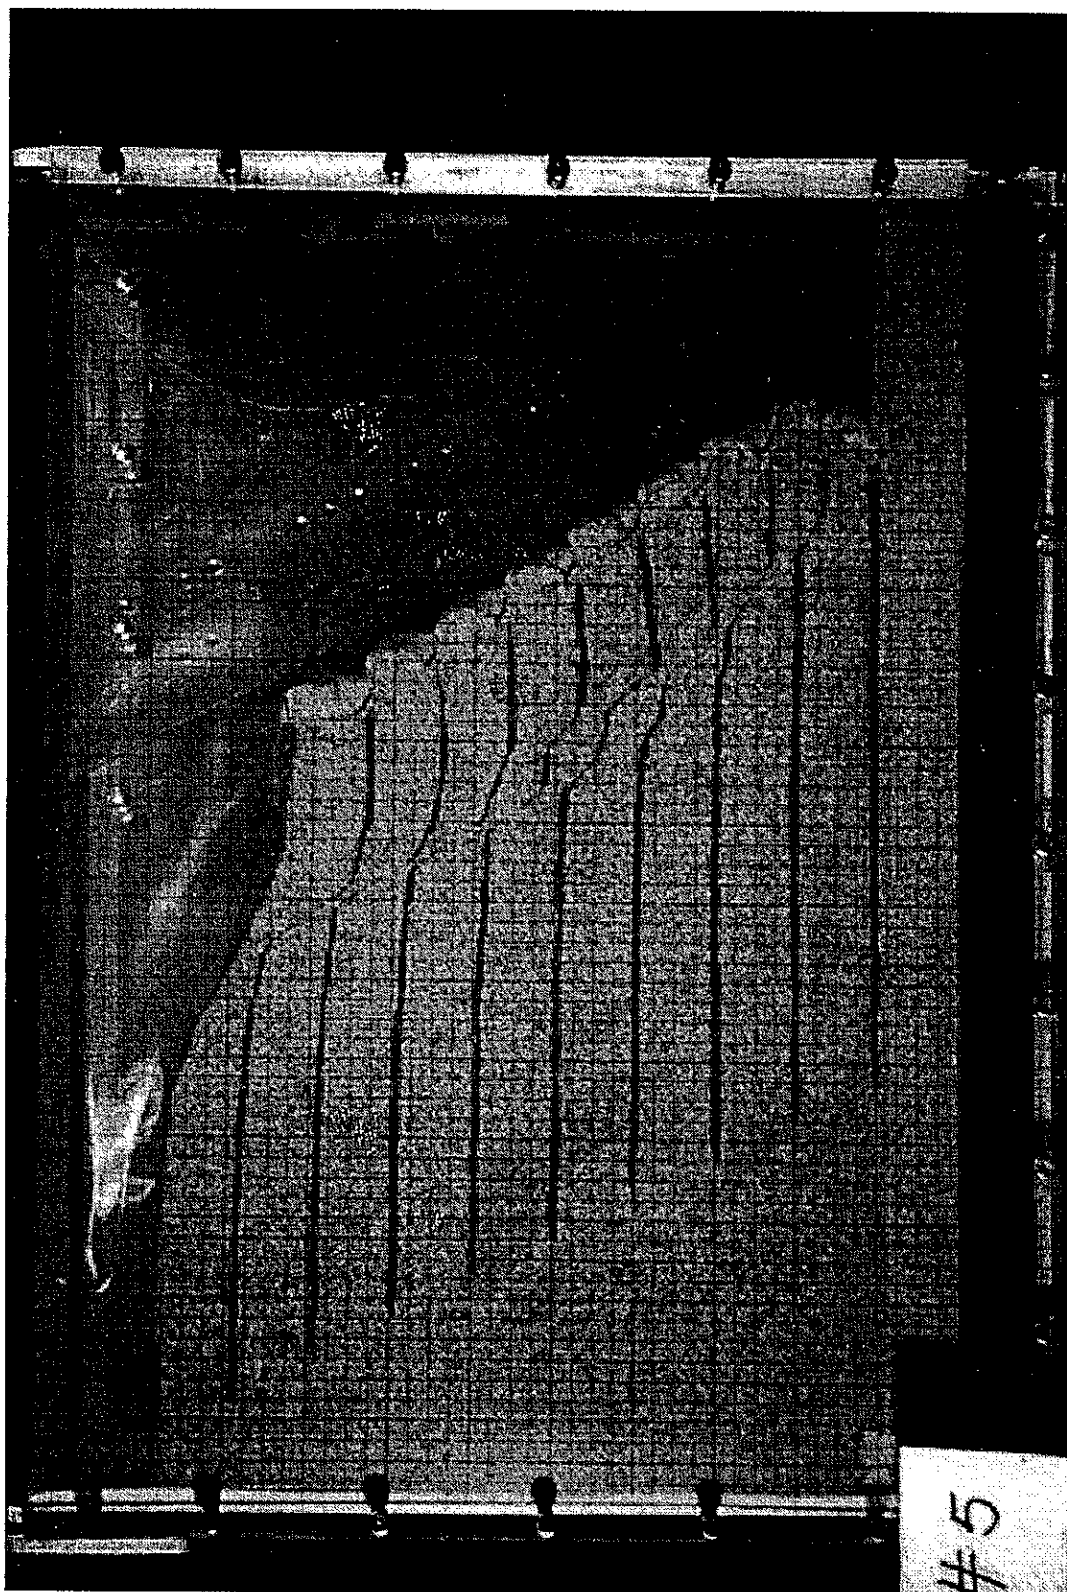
Failure of a geotextile-reinforced slope model in a geotechnical centrifuge (after Zornberg et al., 1995)
